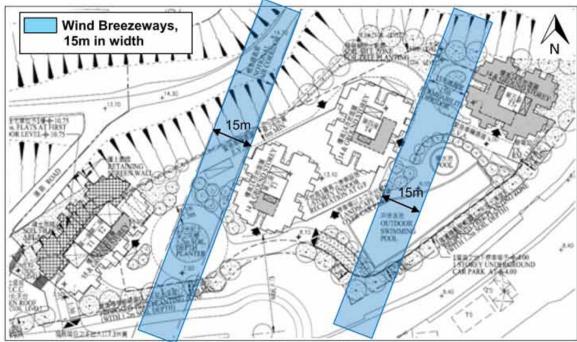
Layout Plan for the Base and Proposed Schemes
